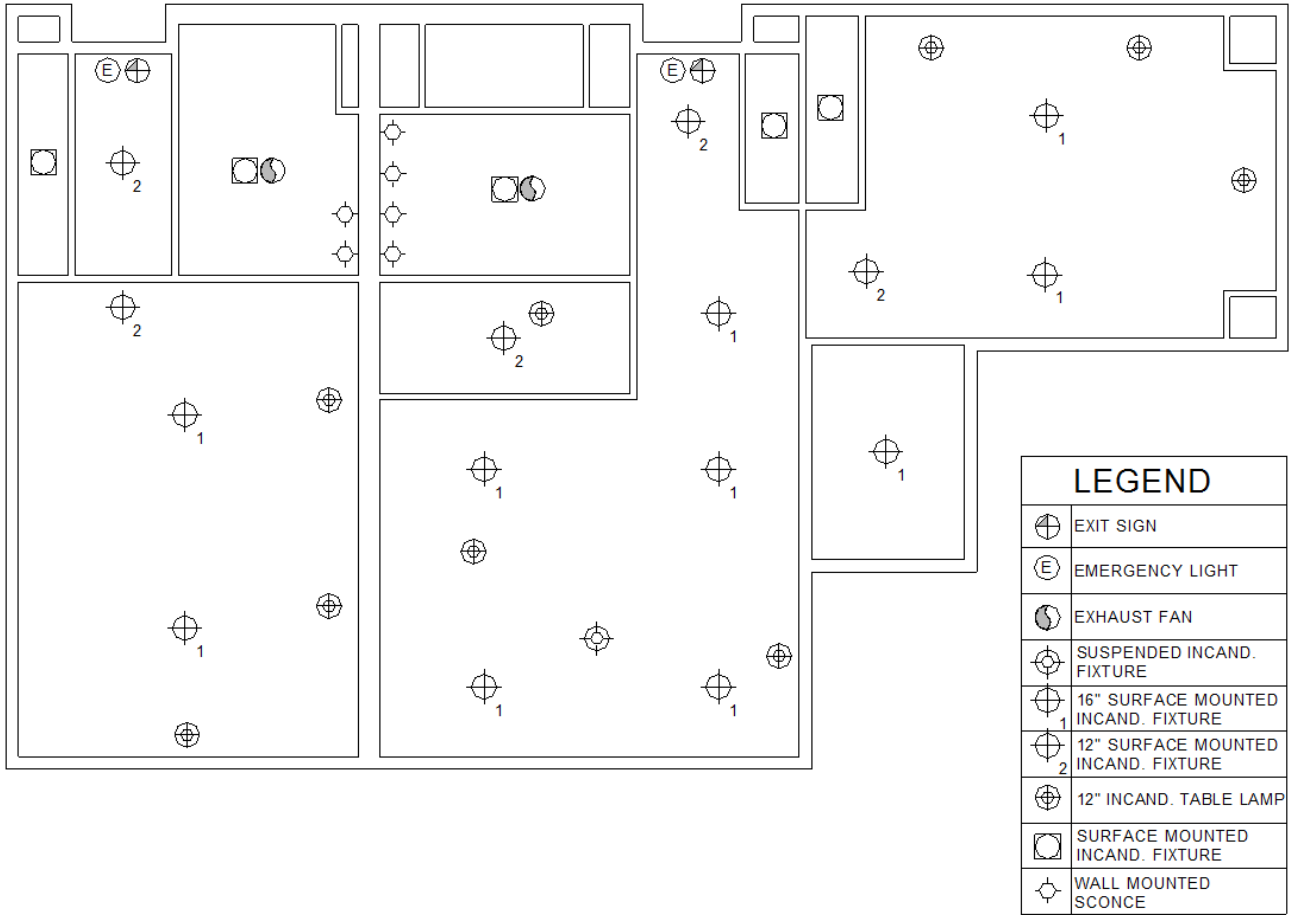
Reflected Ceiling and Lighting Plan and Legend
